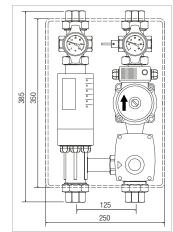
Dimensions of REHAU temperature control station TRS-20
